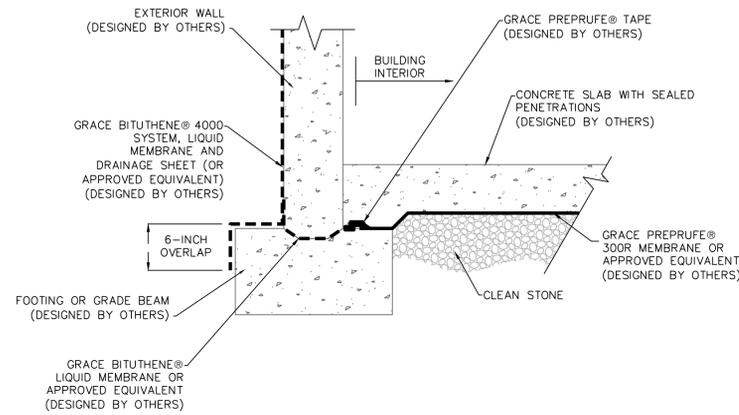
TYPICAL VAPOR BARRIER ASSEMBLY AT INSIDE CORNER
